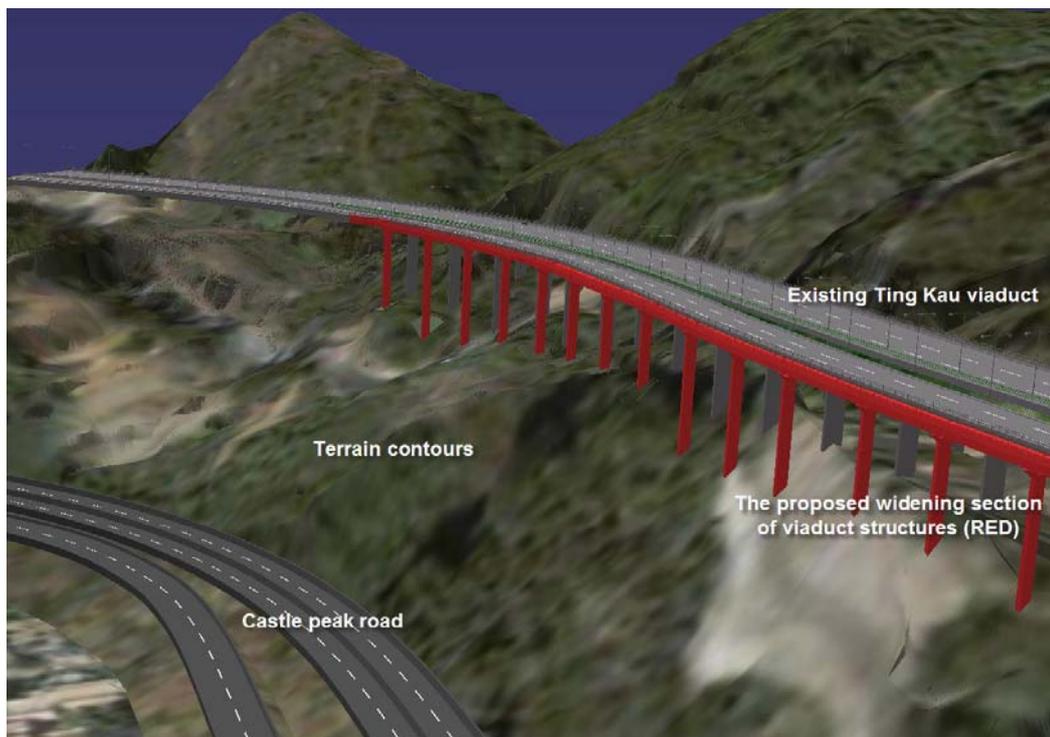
Virtual terrain contours, existing viaduct, Castle Peak Road and the proposed widened section of viaduct structures
